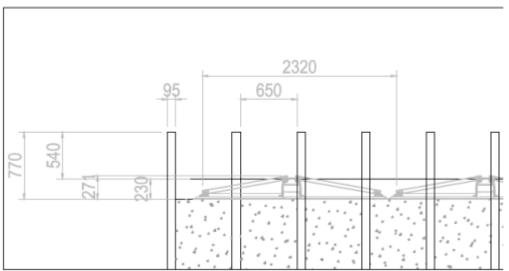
Cross section of the solar PV panels, the roof parapet and the building fins.
